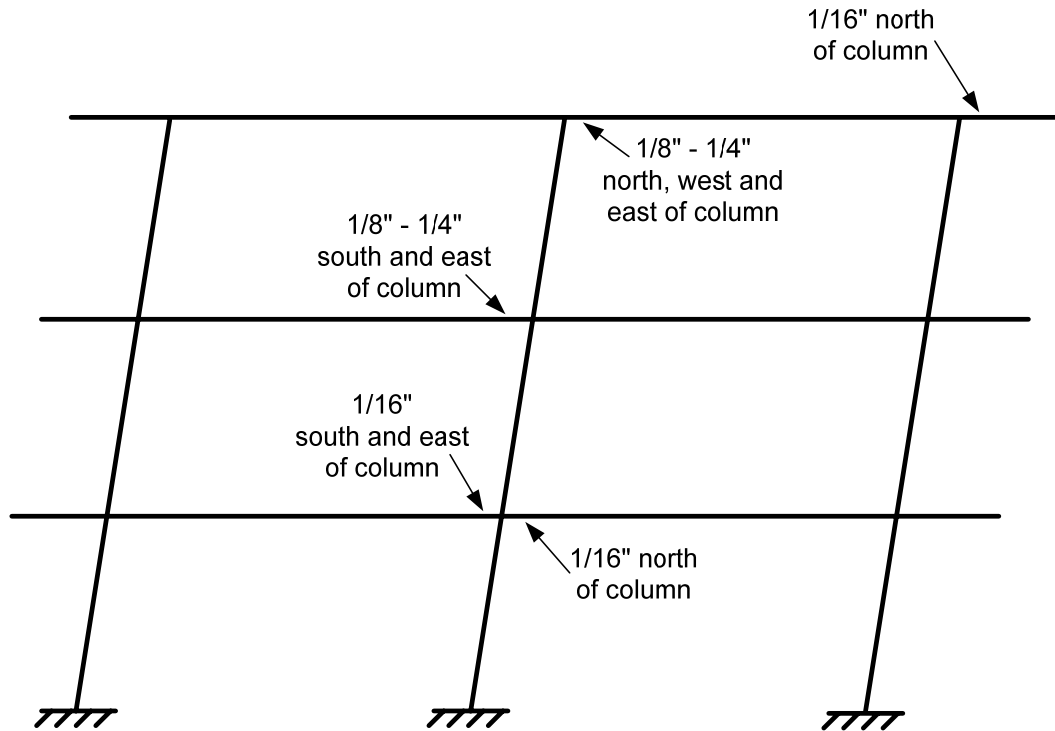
Vertical Slab Separation Frame A, North 3% Roof Drift
